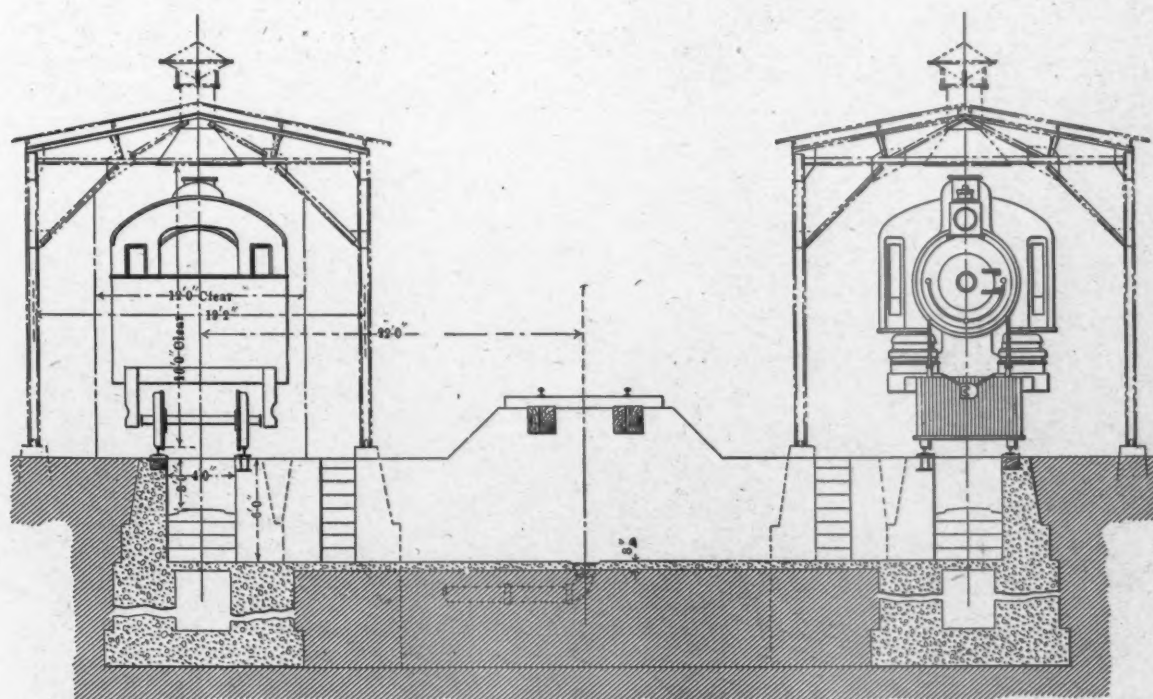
CROSS SECTION AT INSPECTION PITS, SHOWING CONNECTING PASSAGEWAY.
